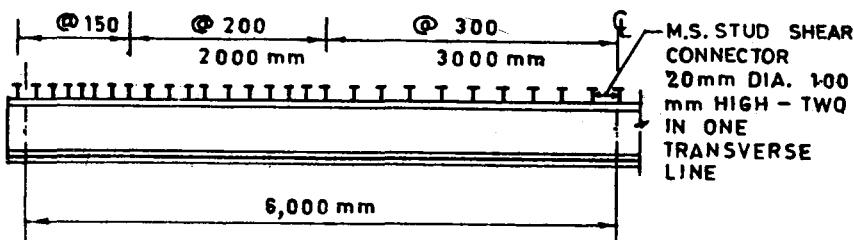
ARRANGEMENT OF SHEAR CONNECTOR (Ex 15.1)
